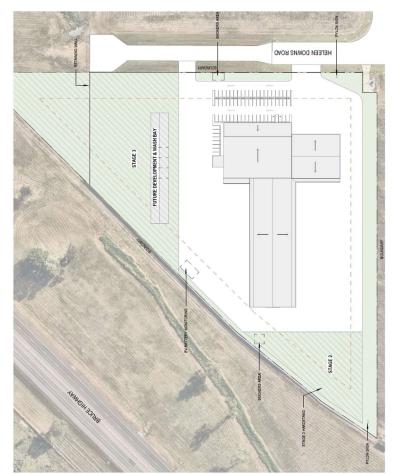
Proposed Concept Master Plan (CA Architects)
